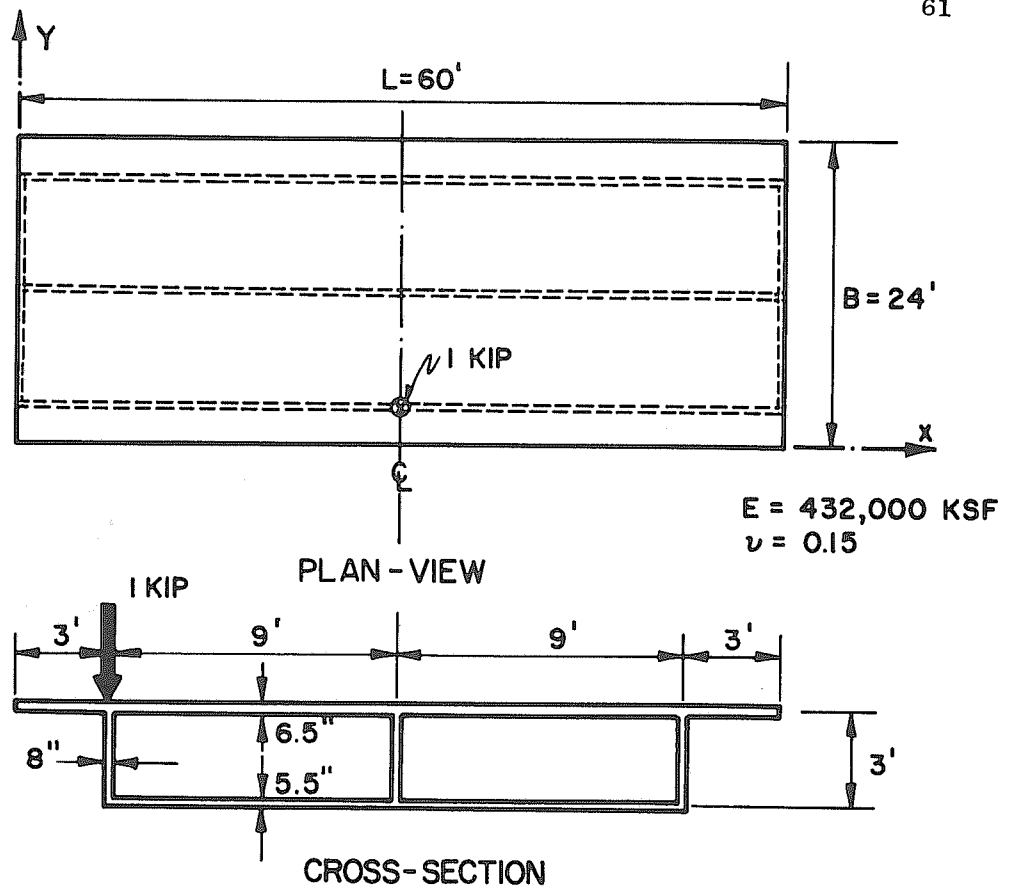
EXAMPLE 4 - TWO CELL BOX GIRDER BRIDGE ON RIGHT SUPPORTS
